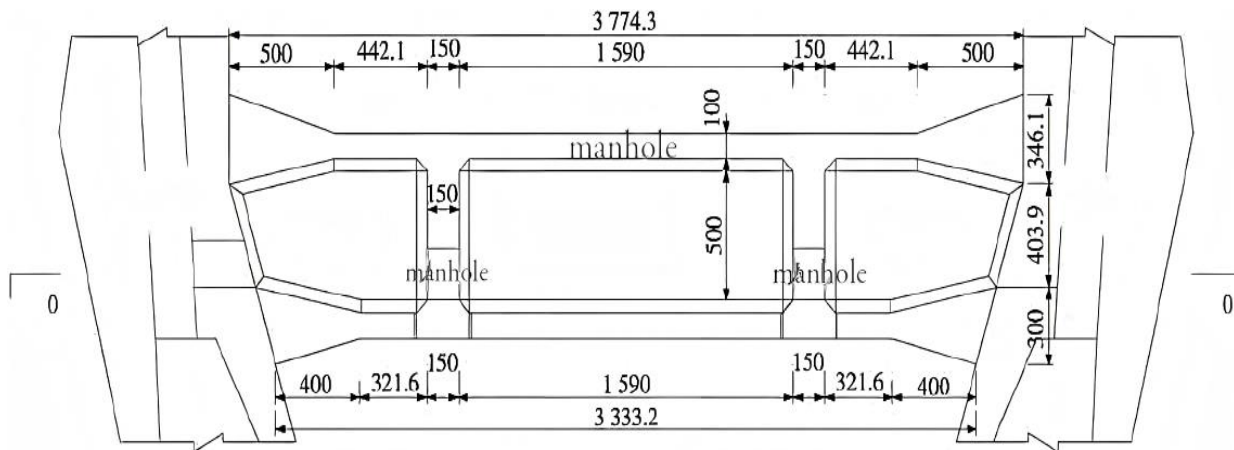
Zhu Xiaoming, Wang Changxi. Construction technology of main tower and crossbeam of kilometer-scale cable-stayed bridge [J], Highway and Automobile Transport, 2018 (03).
